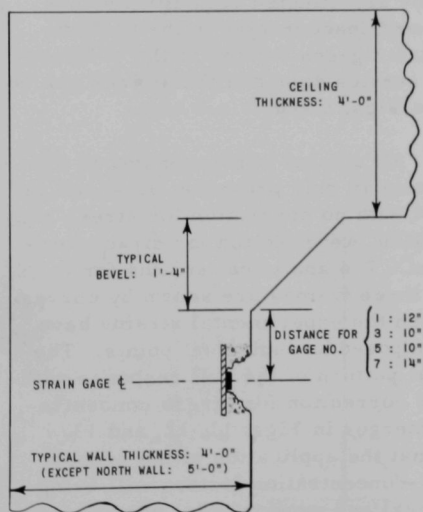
Location of Gages No. 1, 3, 5, 7, Close to the Ceiling
